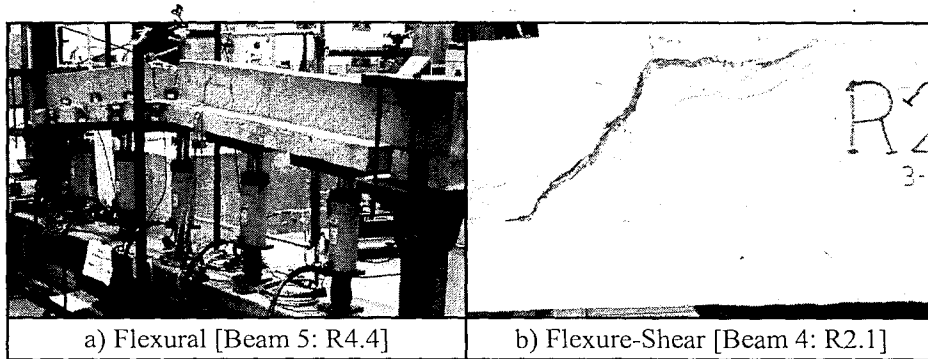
Typical Five-Point Loaded Specimen Failures
